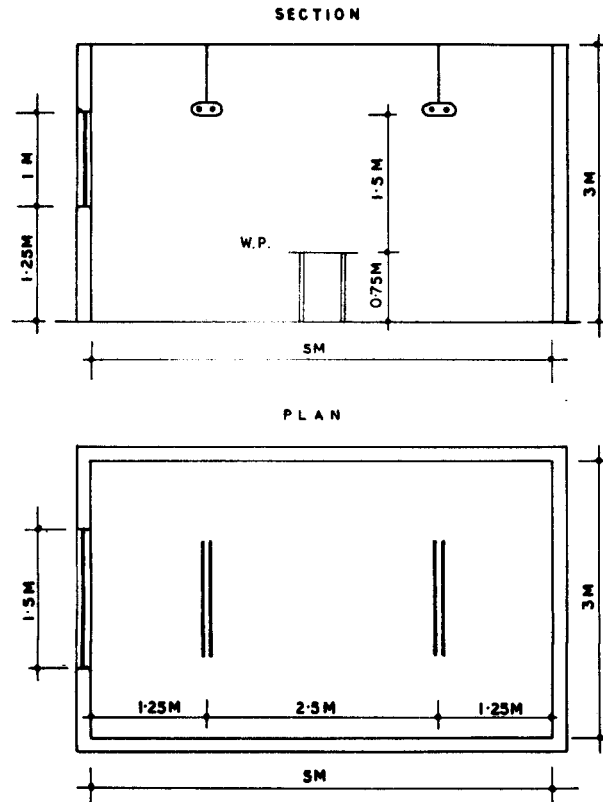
DISTRIBUTION OF TWIN LAMP LUMINAIRES ON SECTION AND PLAN (EXAMPLE 26)
